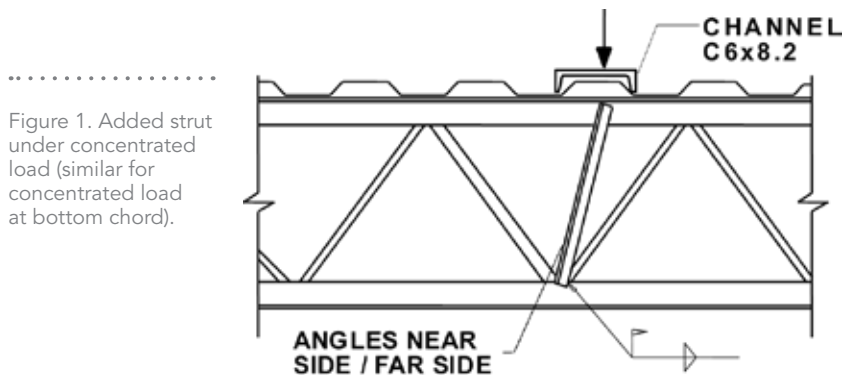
Added strut under concentrated load (similar for concentrated load at bottom chord).
